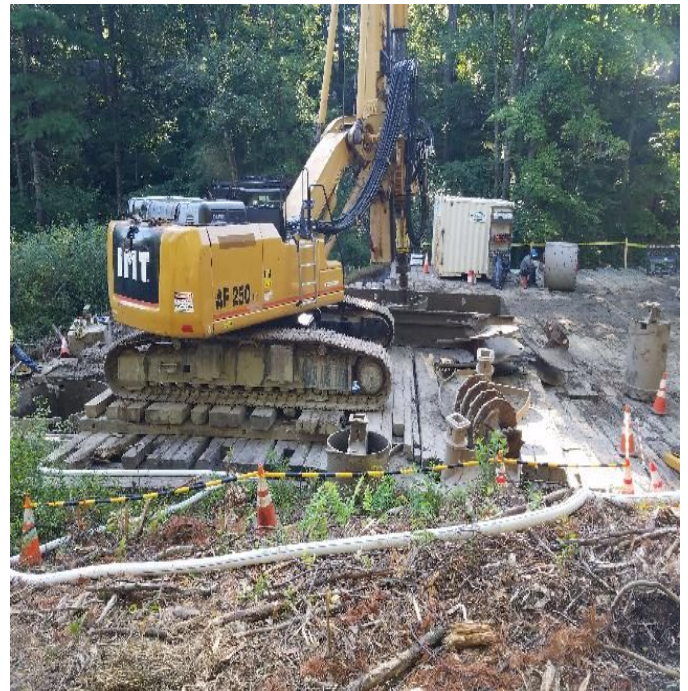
Drilling Str. 28 foundation cont. Viewing east. (8-24-19).
